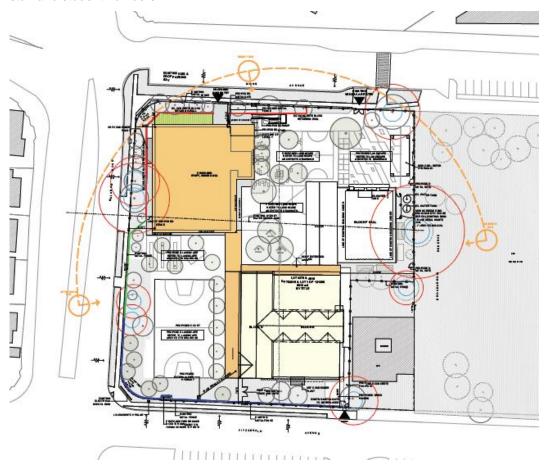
Extract of Proposed Site Plan prepared by JDH Architects
